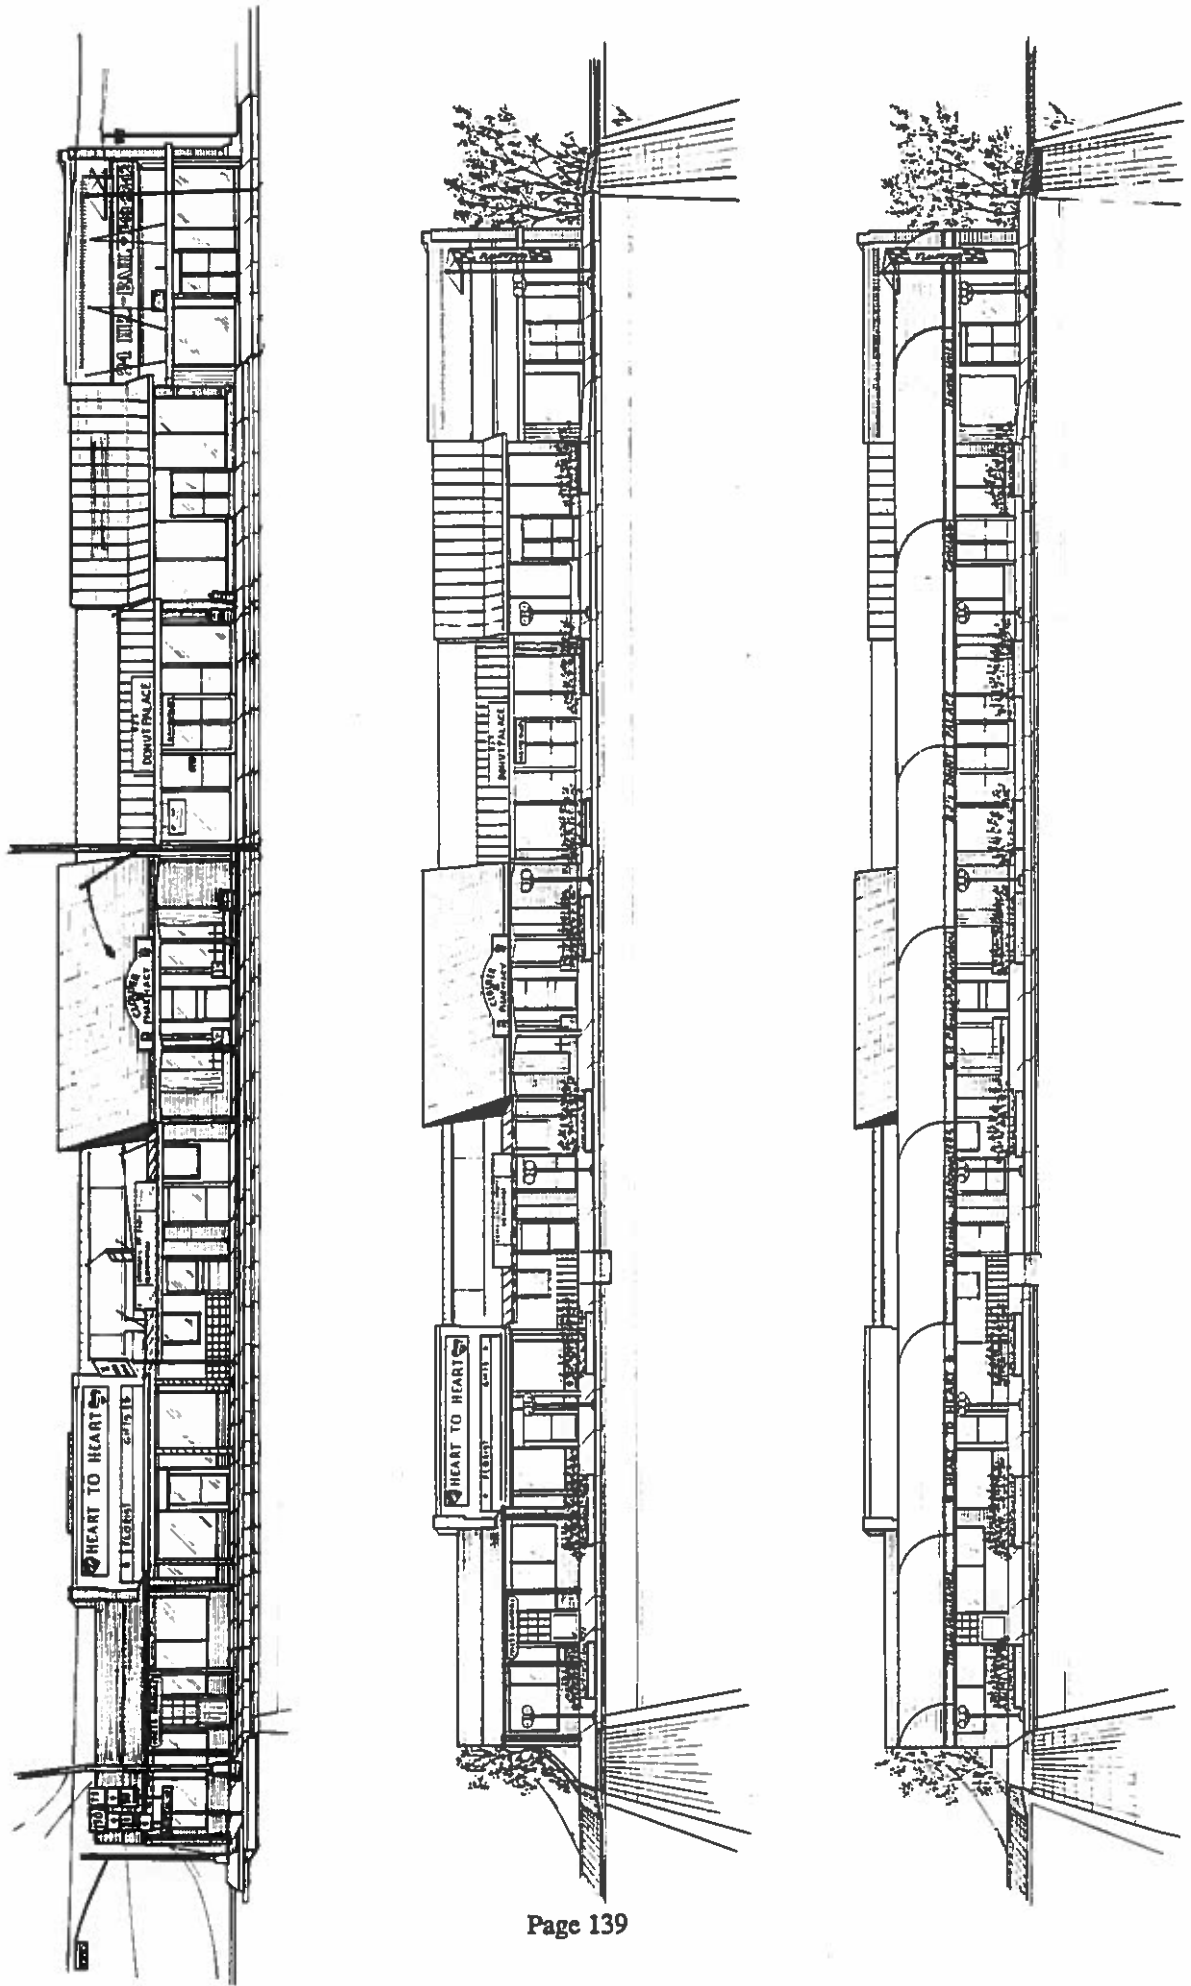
Building Facade Design Alternatives for Madison Street - Looking to the East
